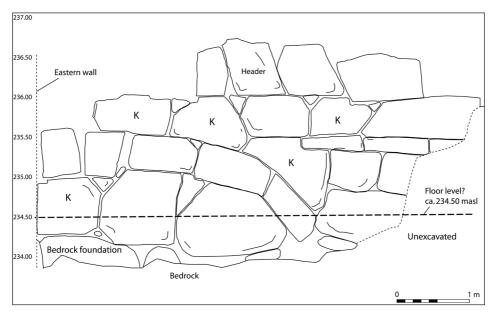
South wall, south-facing elevation with the assumed original floor level at 234.50 masl. Note the frequency of triangular plugs and keyed blocks (K).
